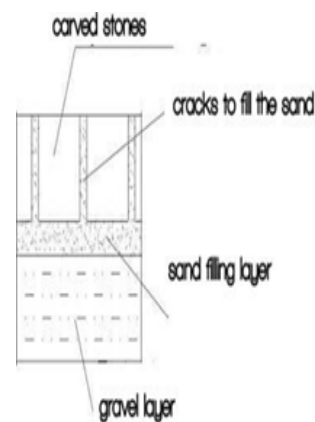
Cross-section illustrating gravel base, sand filling, and placement of carved stones
